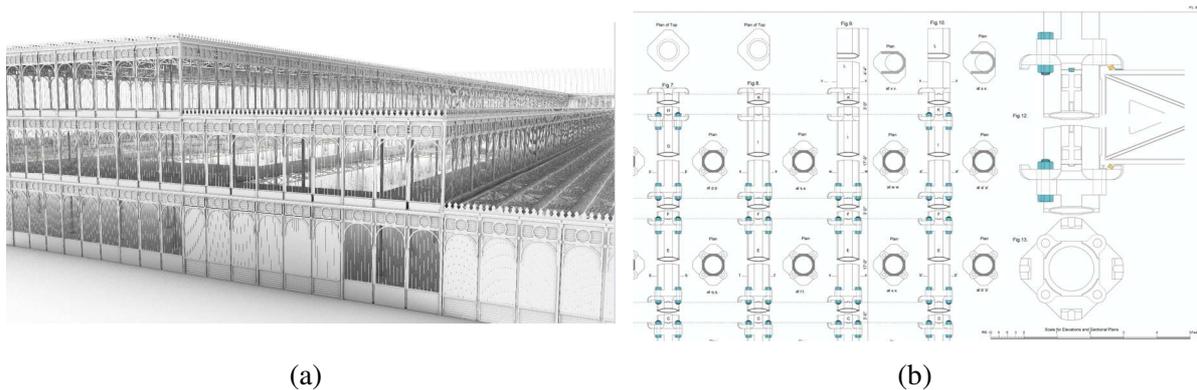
Rigid structural frame, (a) Exterior view of the Crystal Palace on Rhinoceros, and (b) Cross sections of cast-iron columns and details of joint between cast-iron girder and column in PL.8 (traced and colored by third author).
